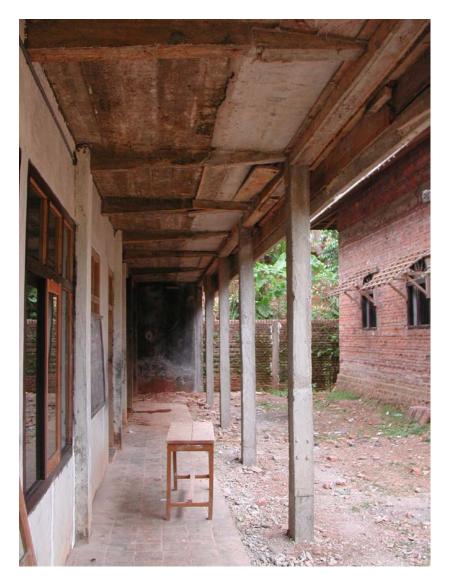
MTs Al-Fatah showing inadequate ground floor structure
